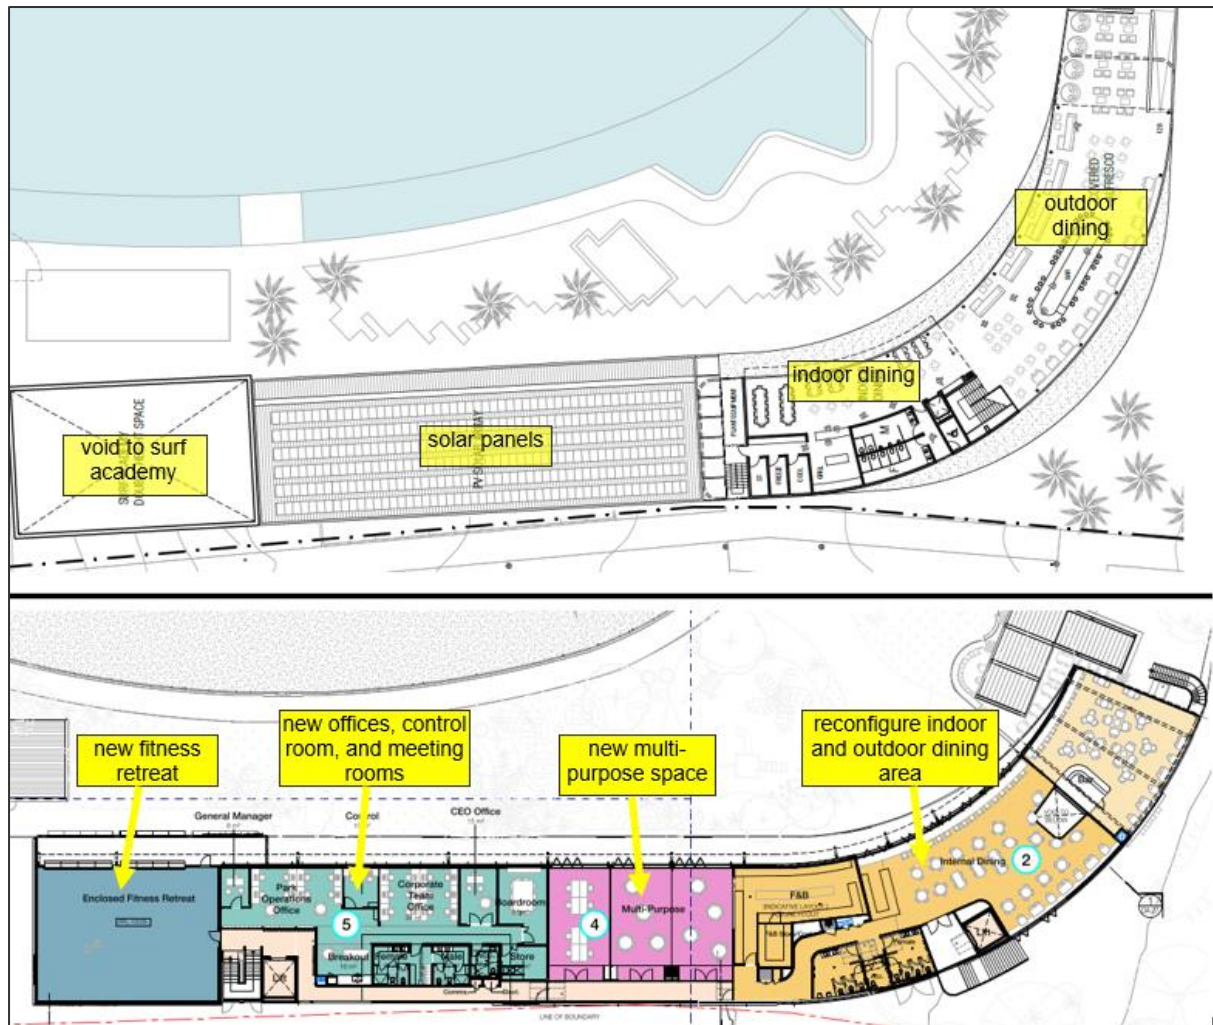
| The approved first floor plan and (top) and proposed (bottom) (base source: Modification Report)
